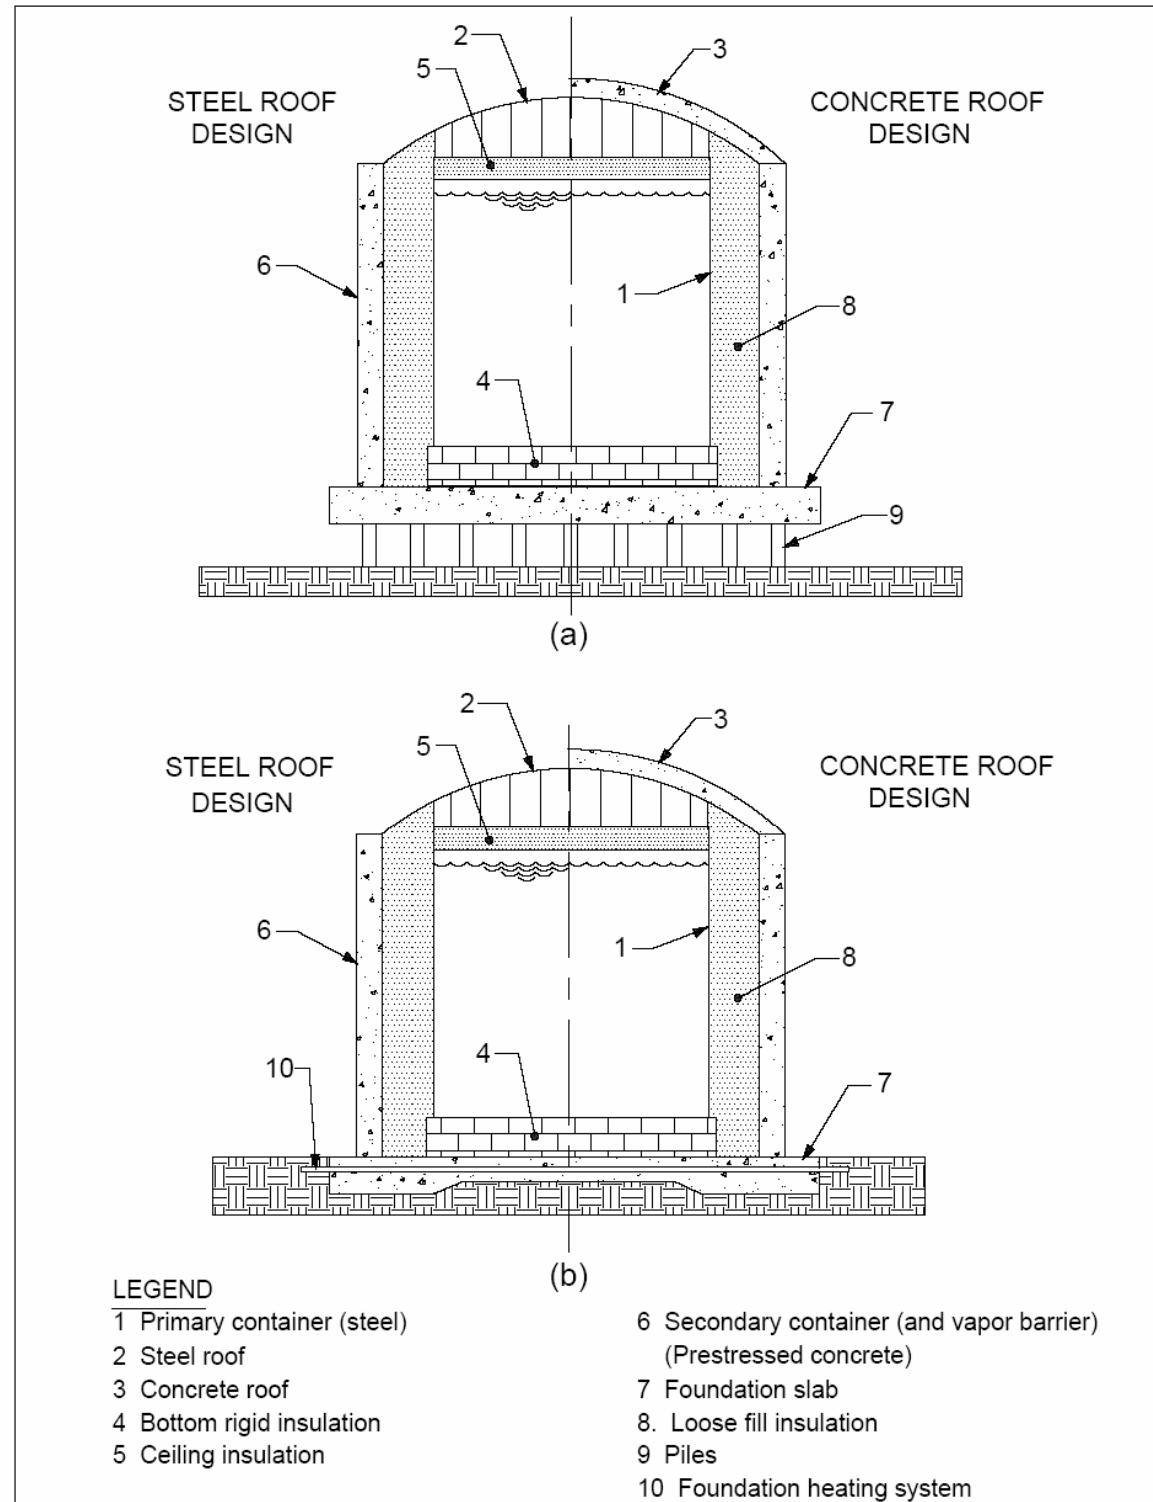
Examples of concrete secondary container walls for a full-containment tank system (Adapted from EN 1473)
